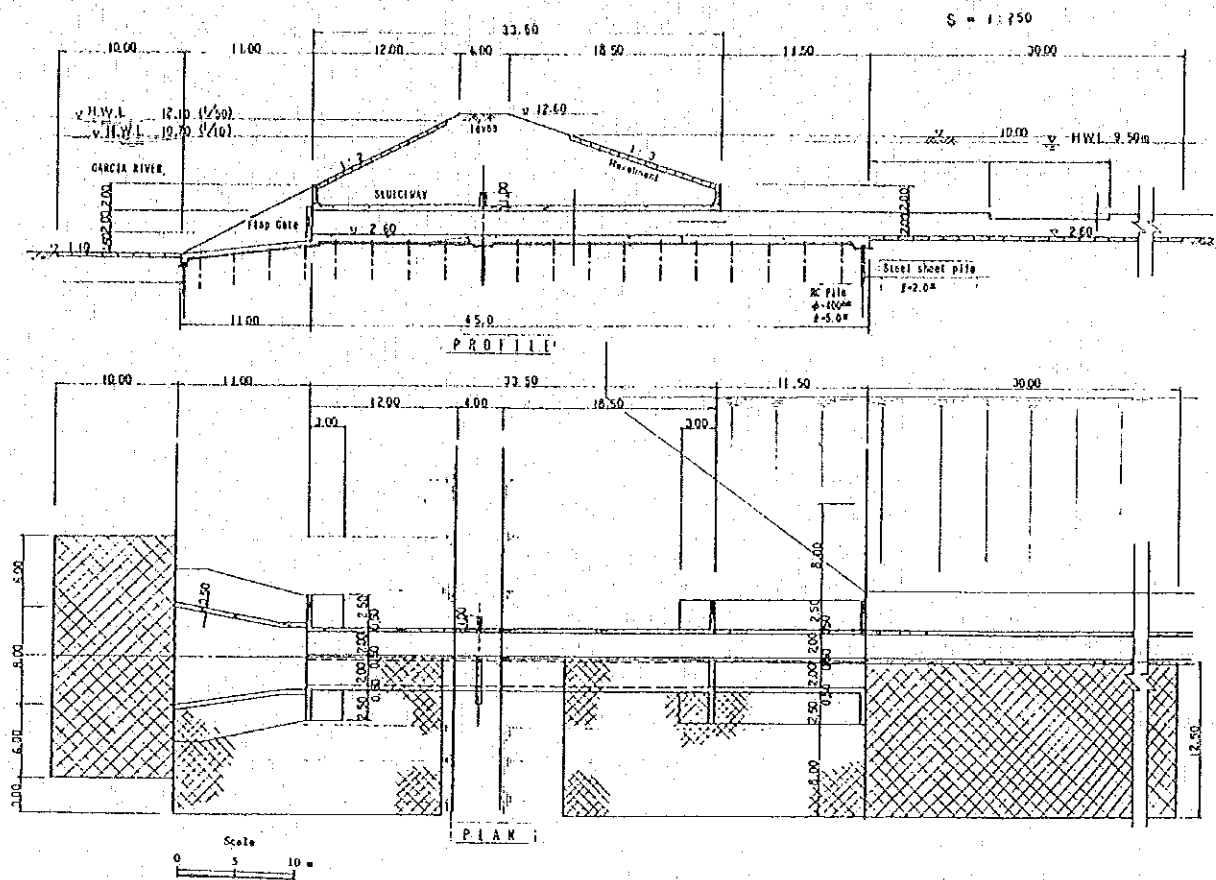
PROPOSED SLUICWAY FOR R-1, R-2 AND R-3 REGULATING PONDS
